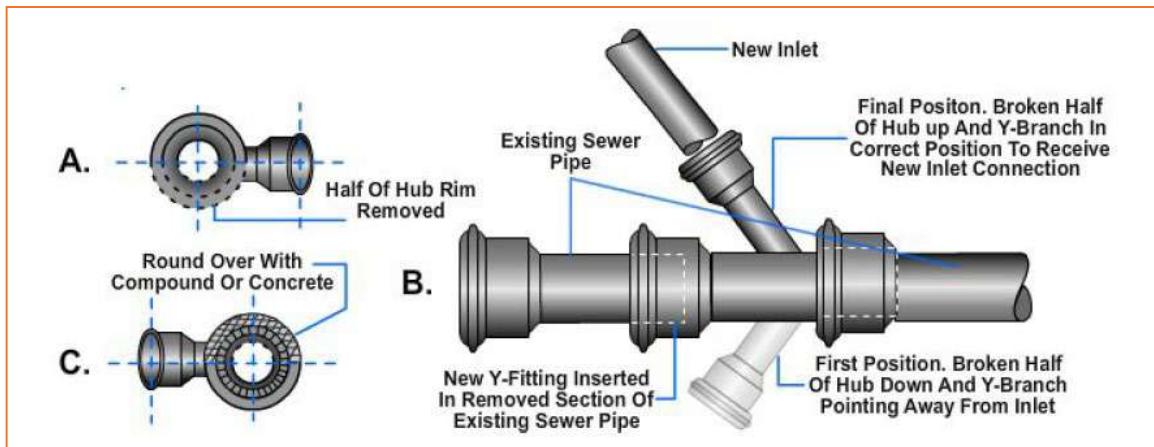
Adding connection to an outside vitrified clay sewer pipe
